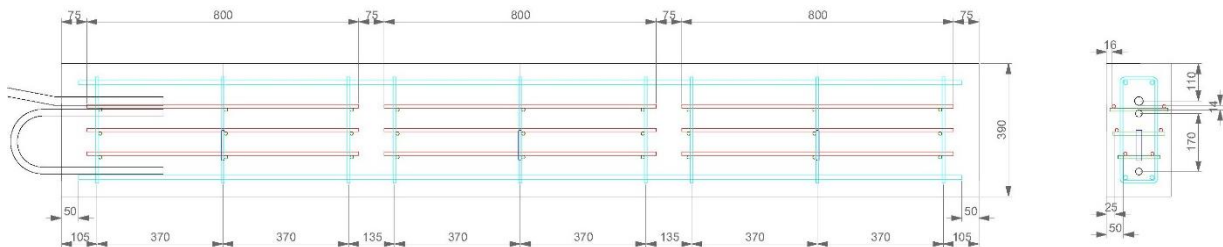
Drawing showing sensor positions in the instrumented concrete elements.
